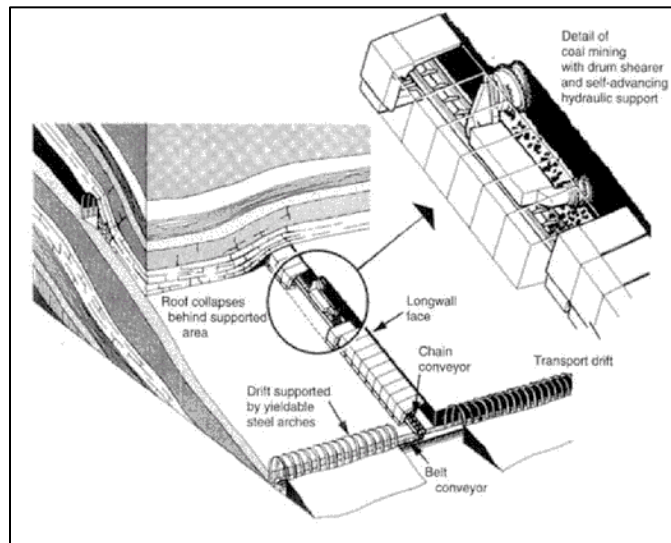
Longwall mining in coal (Hustrulid et. al., 2001)
